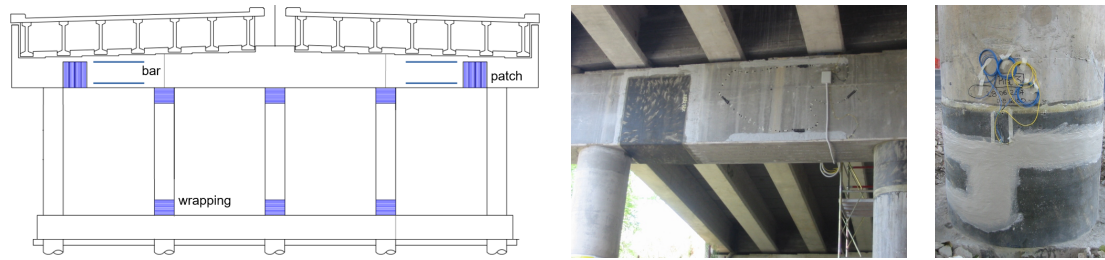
Cross section plan showing the installation locations, and pictures of one patch and one wrapping.
